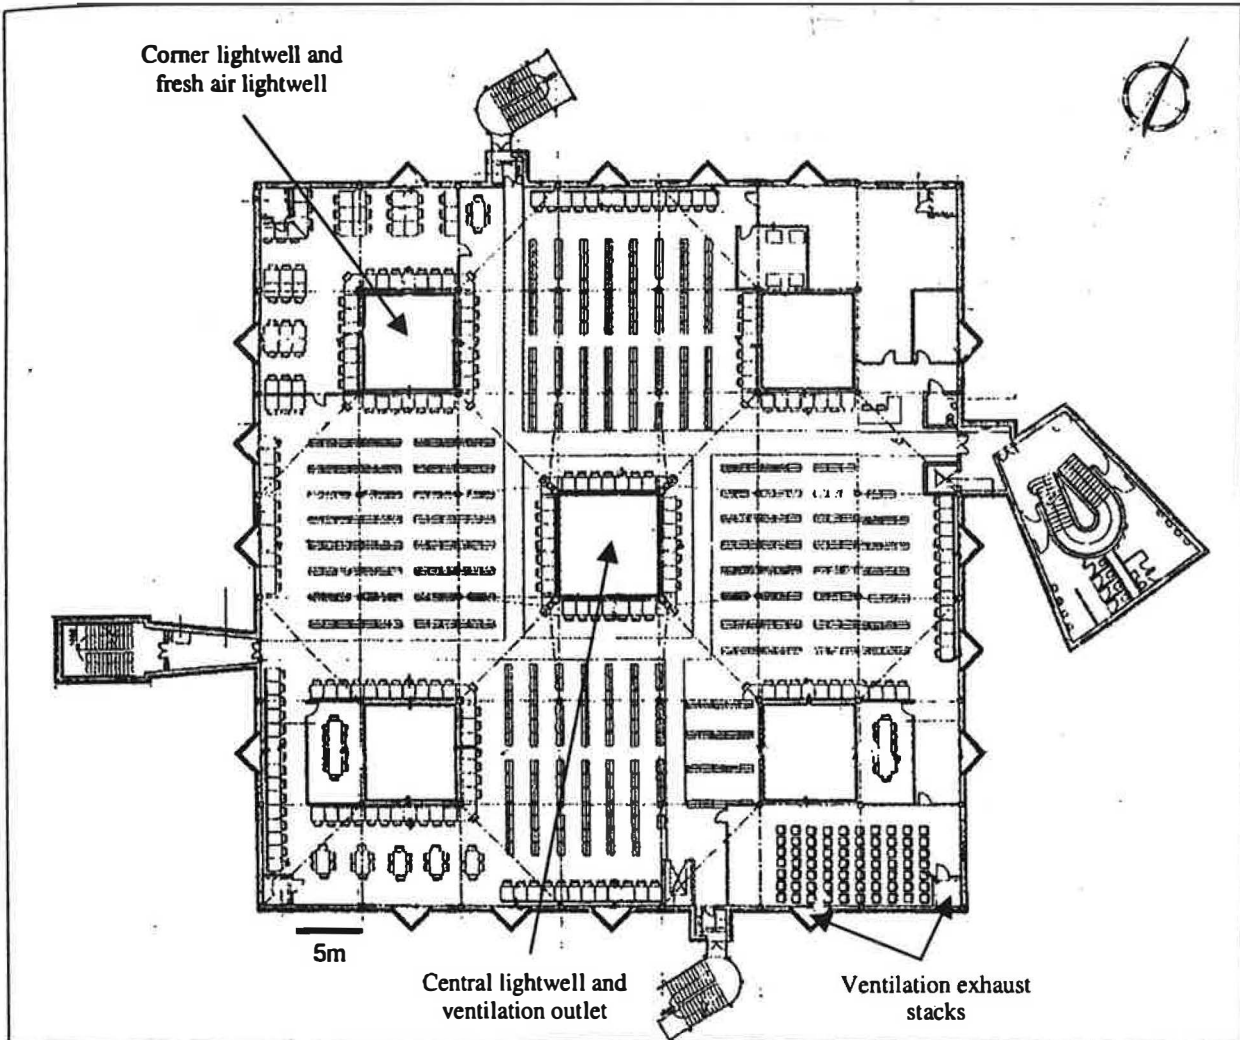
Typical plan of a possible library layout (level 2) showing supply and exhaust airflow routes.
